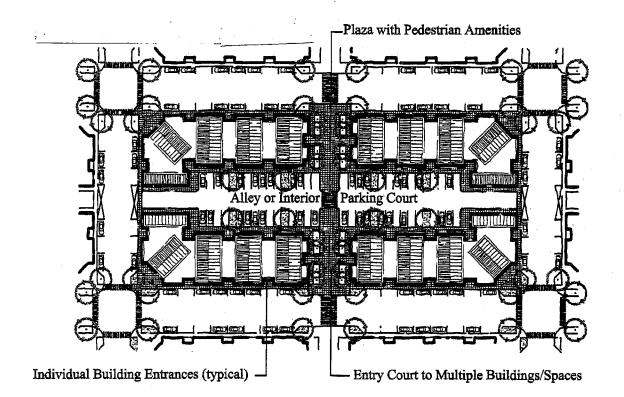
C(2) – Building Orientation With Internal Parking
